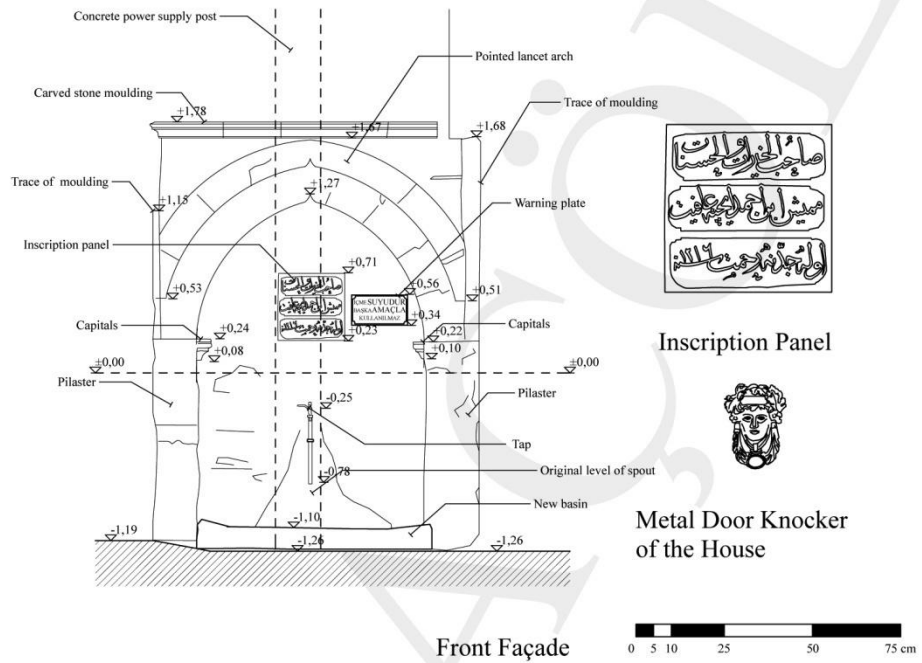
Memiş Ağa House Fountain silhouette and plan drawings
